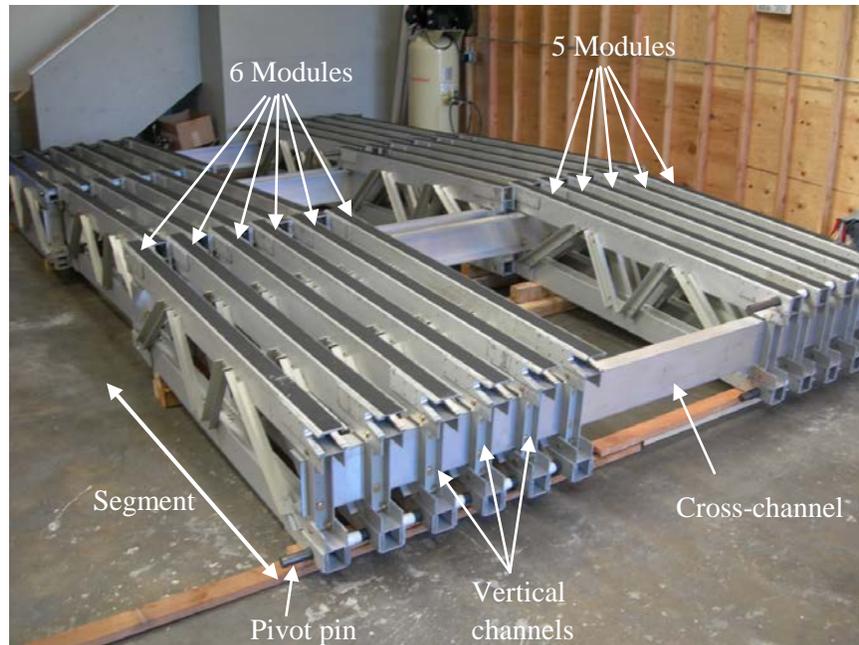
Half-bridge assembly of three segments, each consisting of eleven modules.
